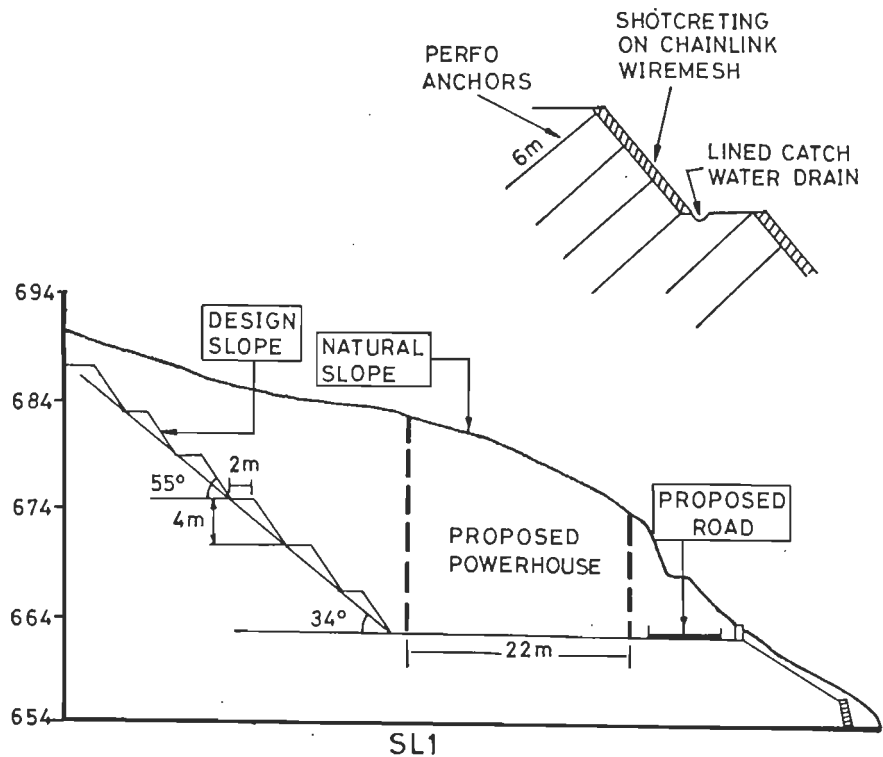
CUT SLOPE DESIGN (IN SECTION) AND STABILITY MEASURES FOR SLOPES ADJOINING TO POWERHOUSE SITE.
